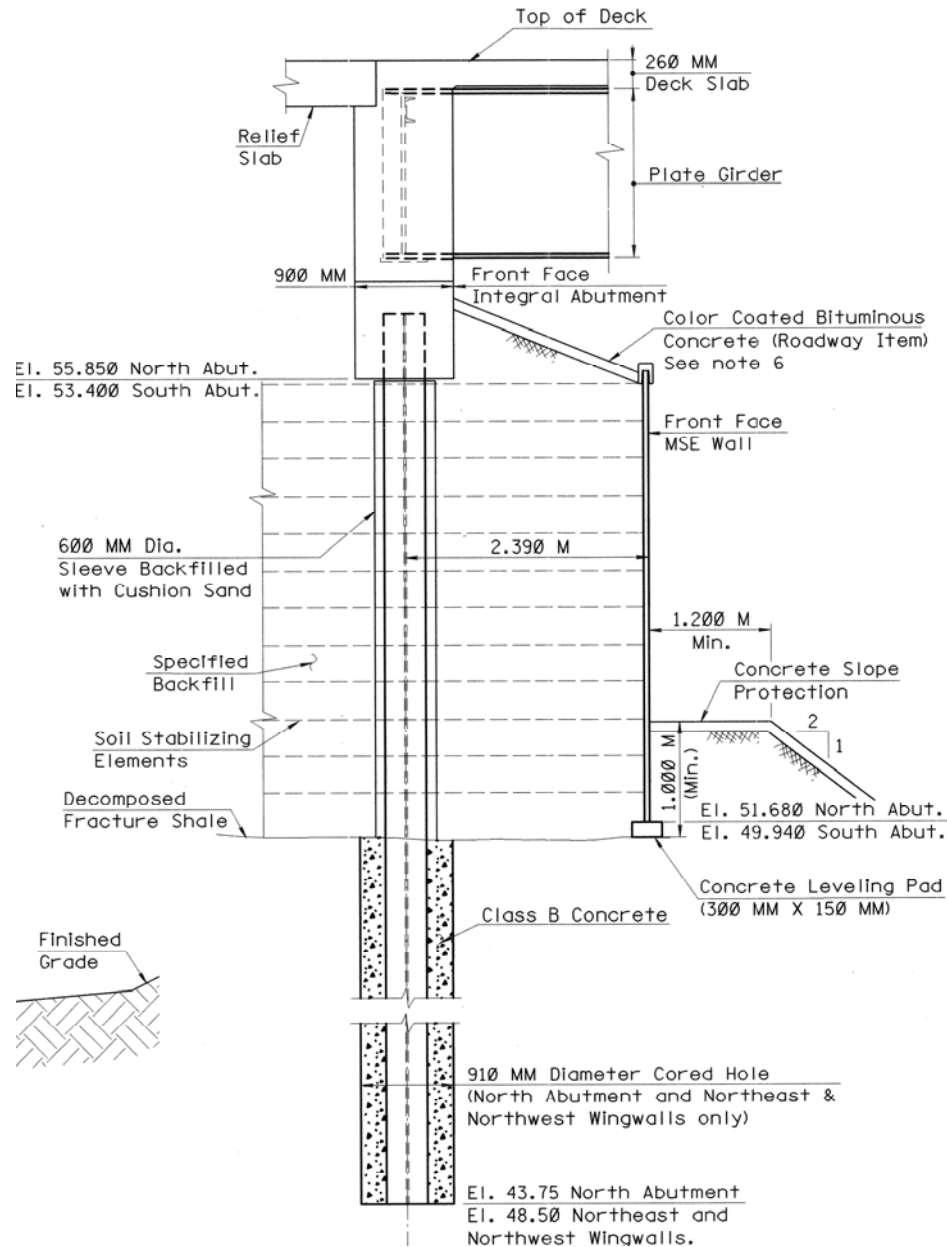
Scotch Road Bridge - Foundation Details (Courtesy of NJDOT)
